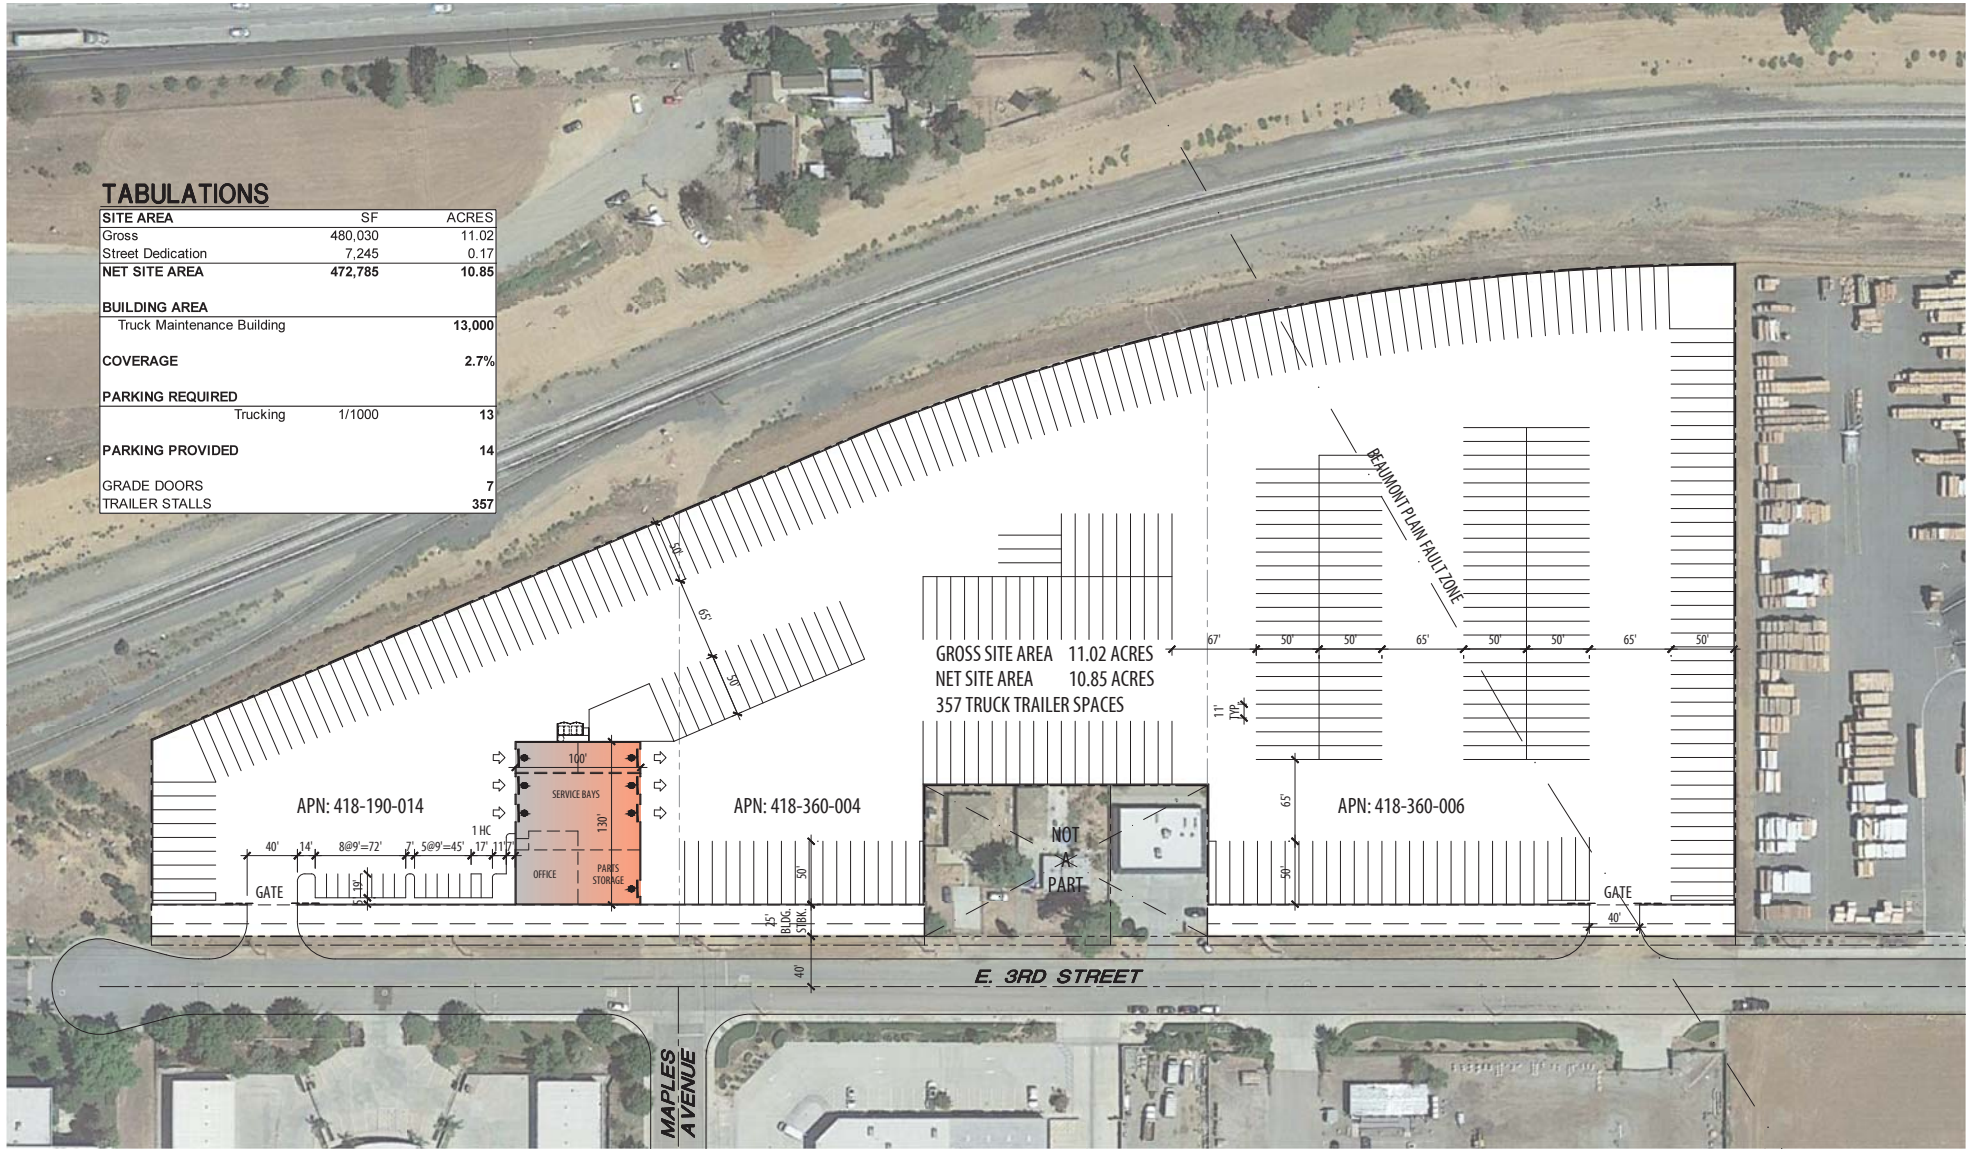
APNs 418-190-014, 418-360-004, & -006 Site Plan
